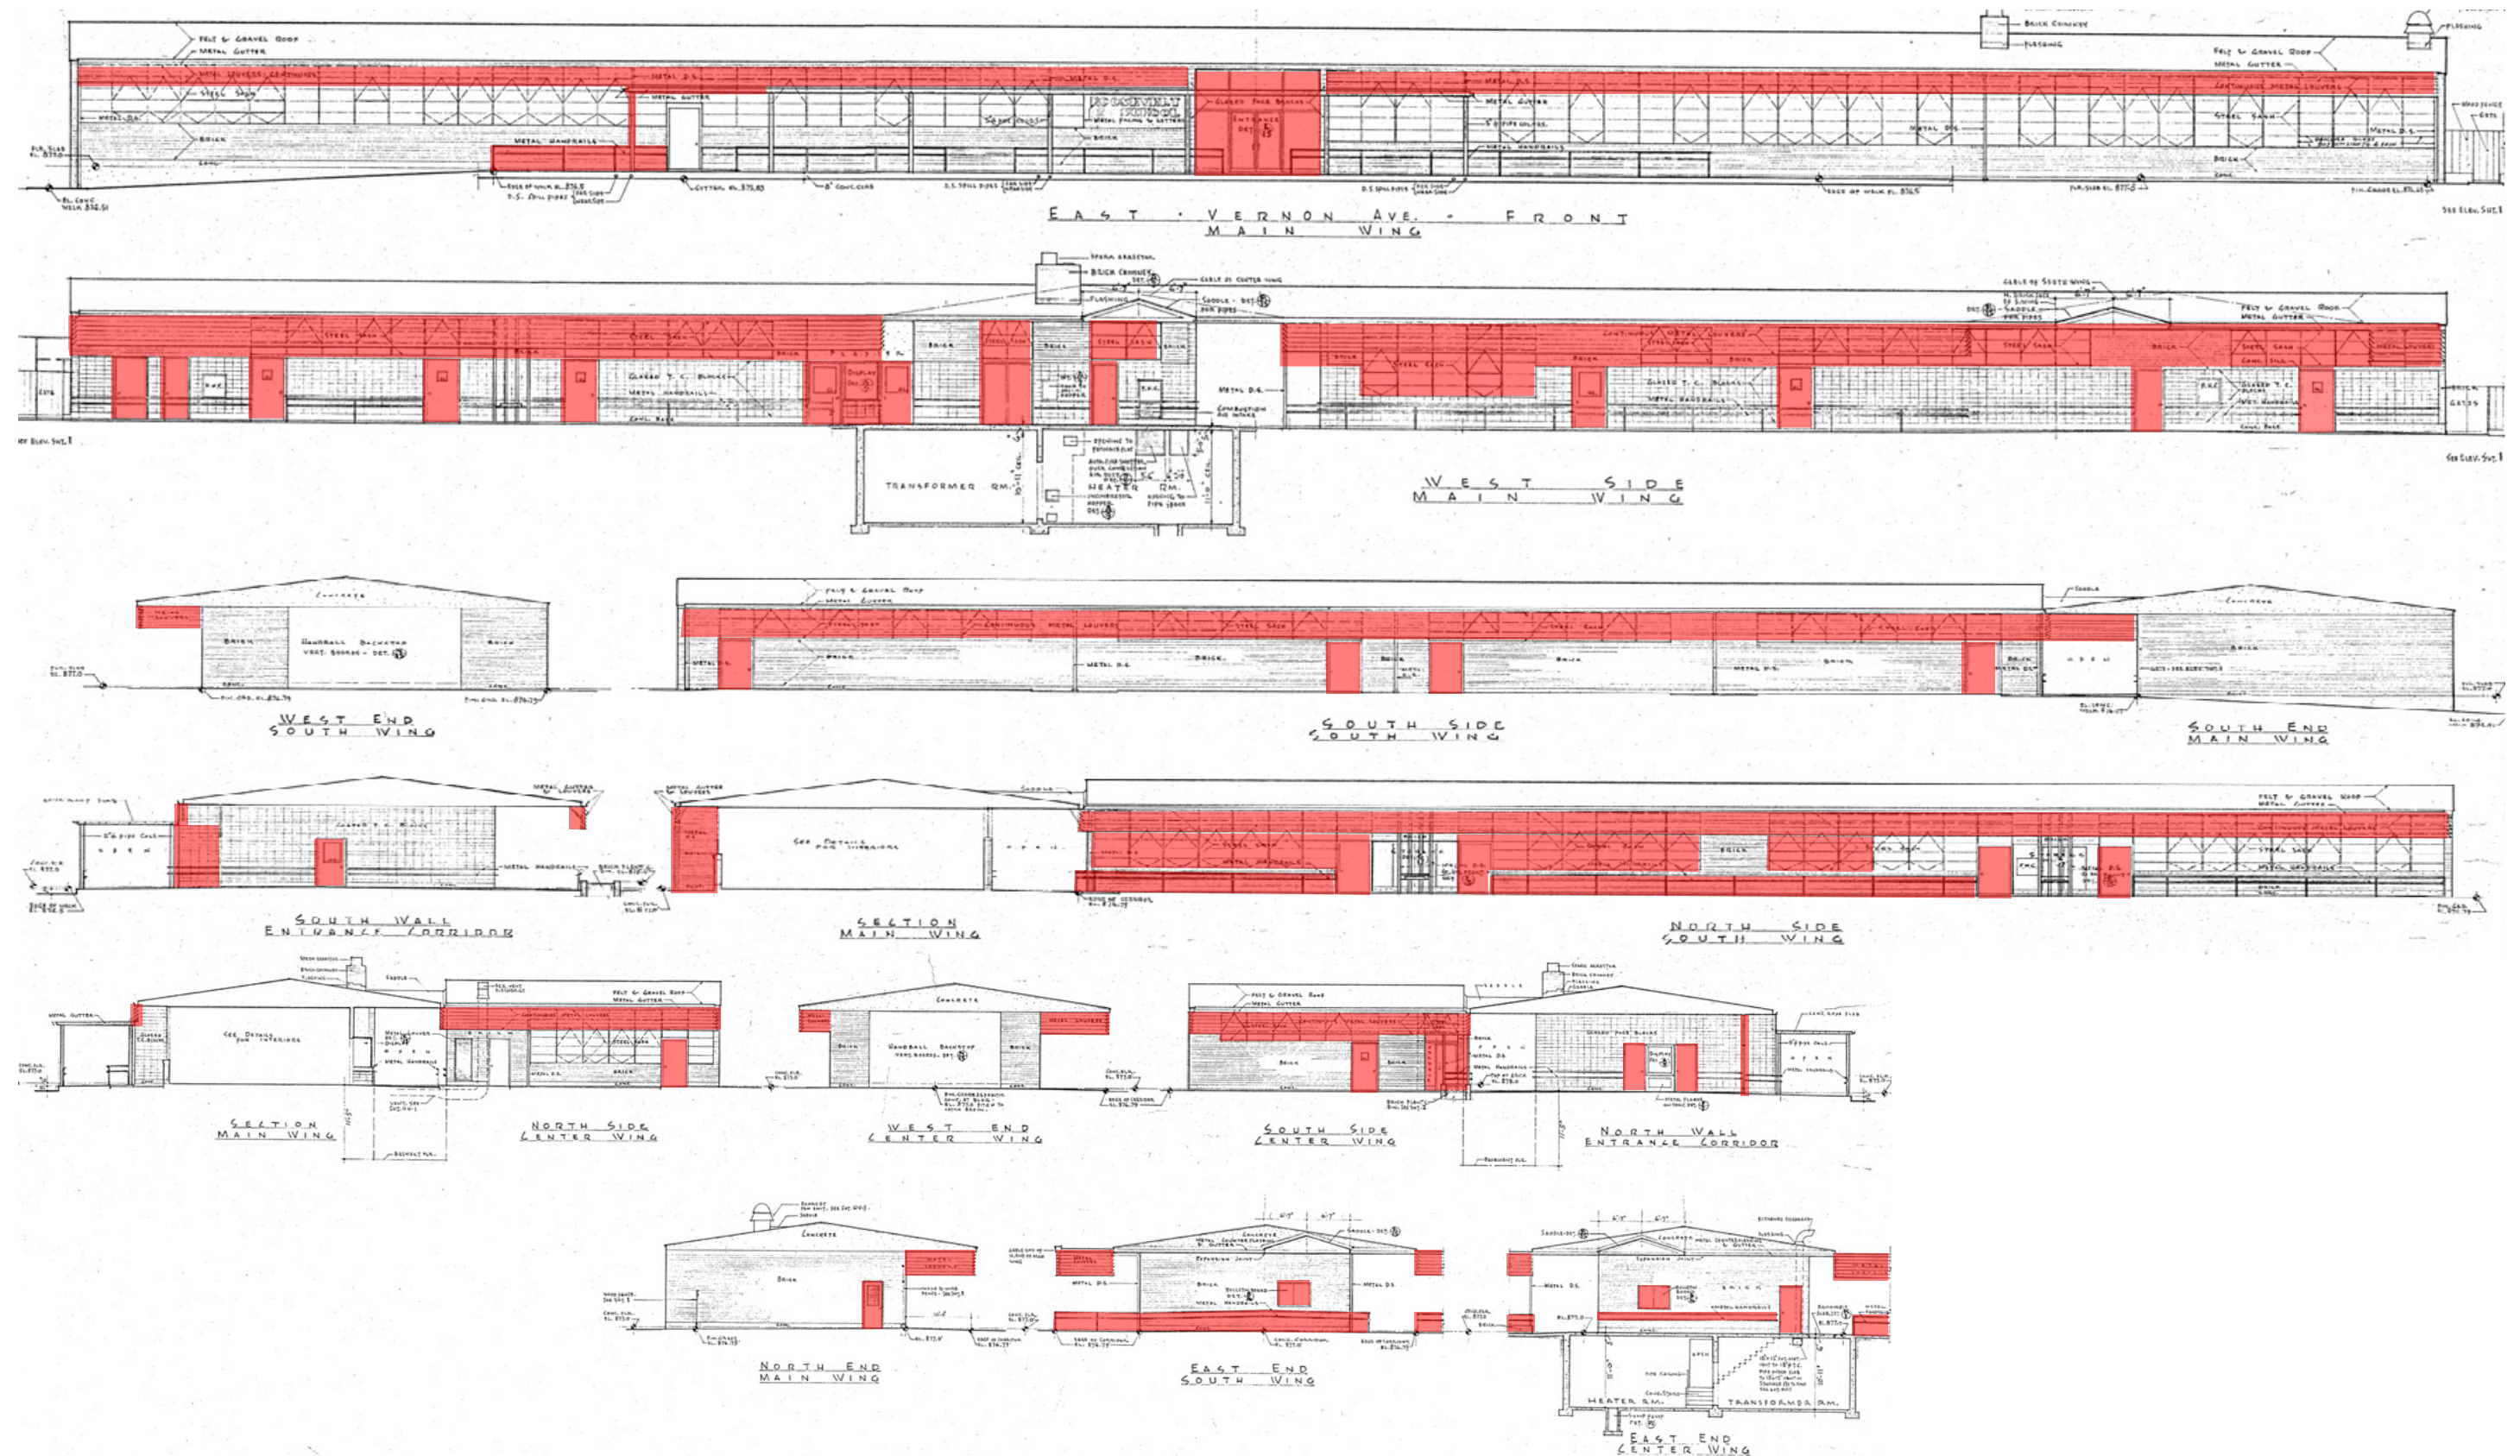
ROOSEVELT SCHOOL – 1953 EXTERIOR BUILDING ELEVATIONS ILLUSTRATING REMOVAL OF ORIGINAL EXTERIOR ELEMENTS (IN RED)
